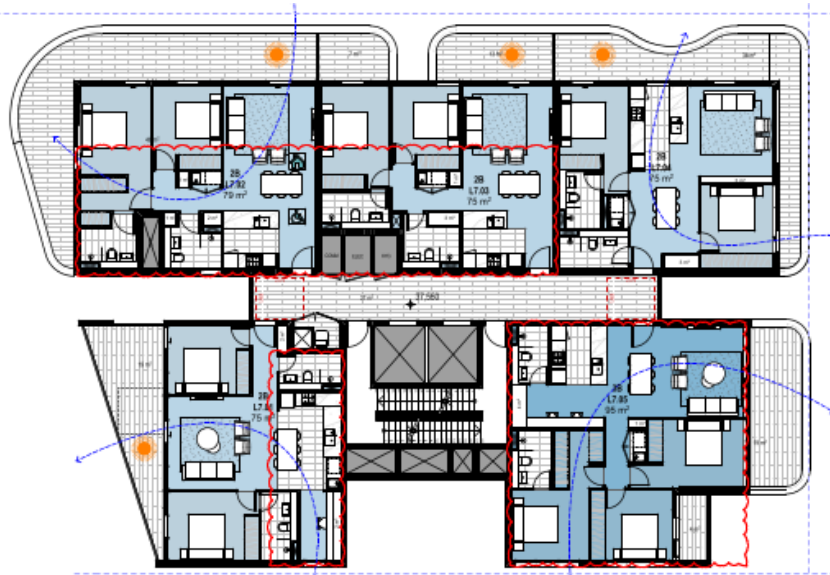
Extract of the proposed floor plan of Levels 6-7 in the current modification application.
